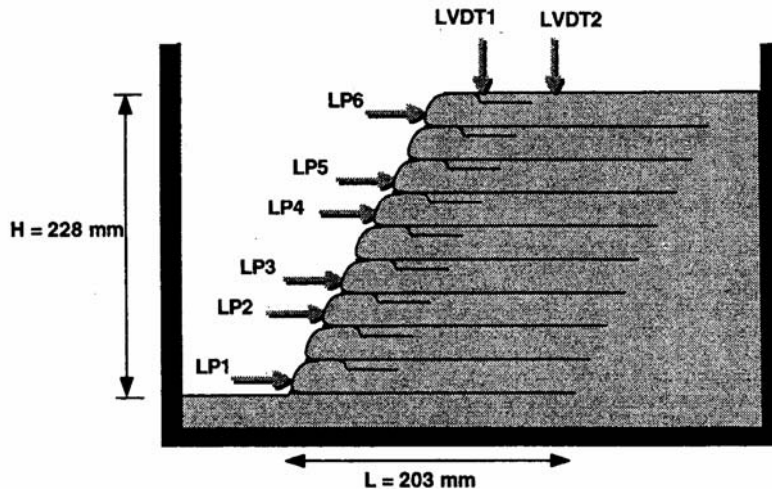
Centrifuge model with 2.5 cm reinforcement spacing
